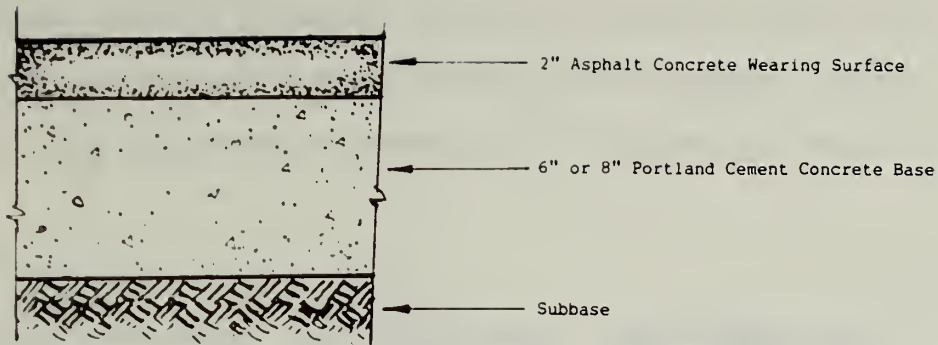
PAVEMENT CROSS SECTION FOR MAJOR STREETS
